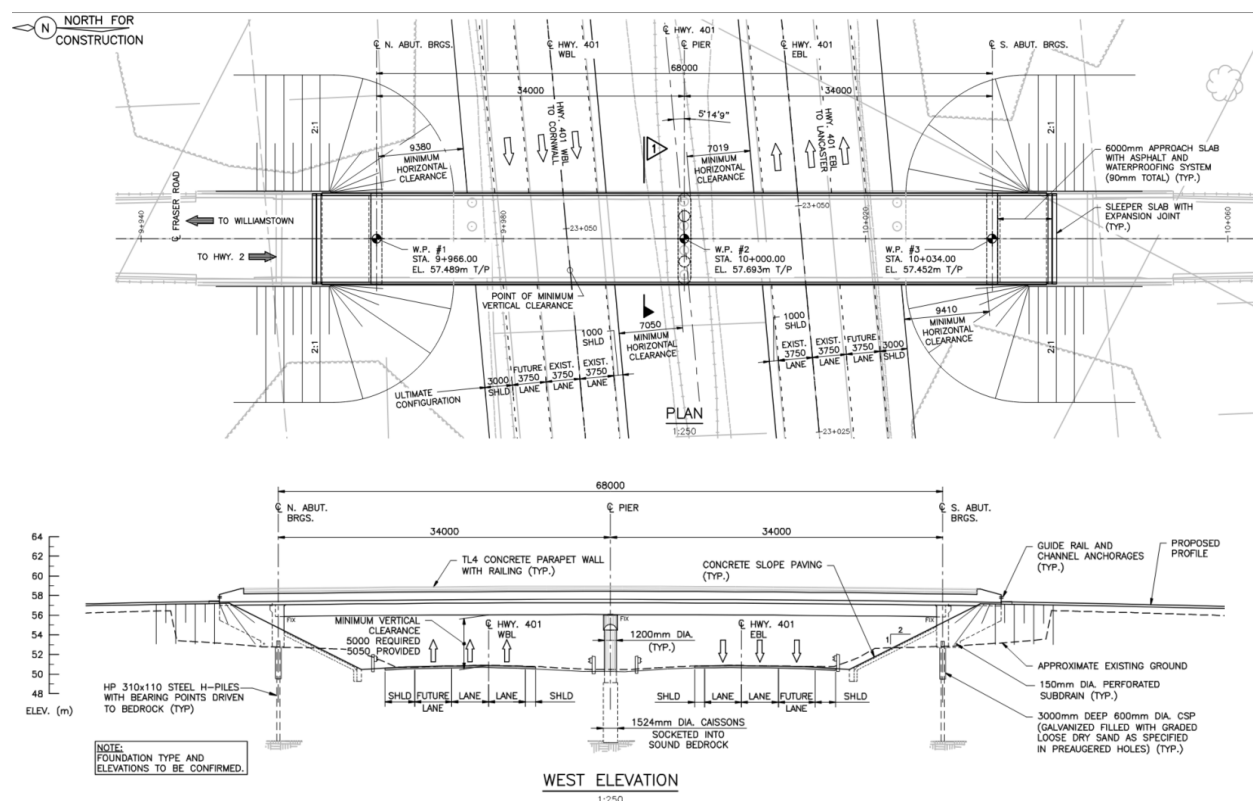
Plan view and cross section showing the existing approach embankment location and proposed changes in geometry for future embankment (Ref: Dillon's General Arrangement Drawing)
